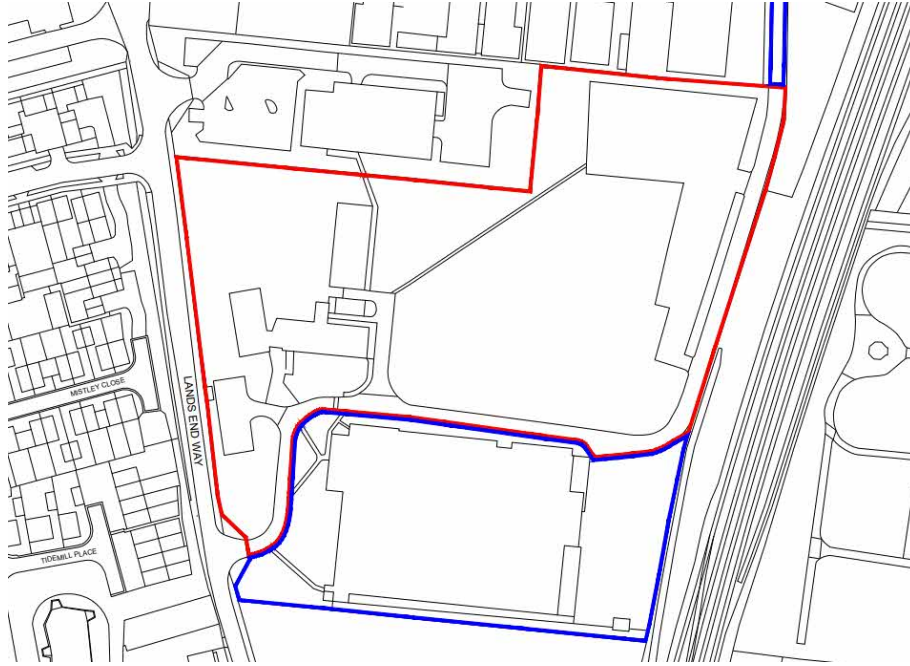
Existing site plan – drawing 1600529.2.10 rev B– April 2024 drawn by JMP at Marrons Planning
